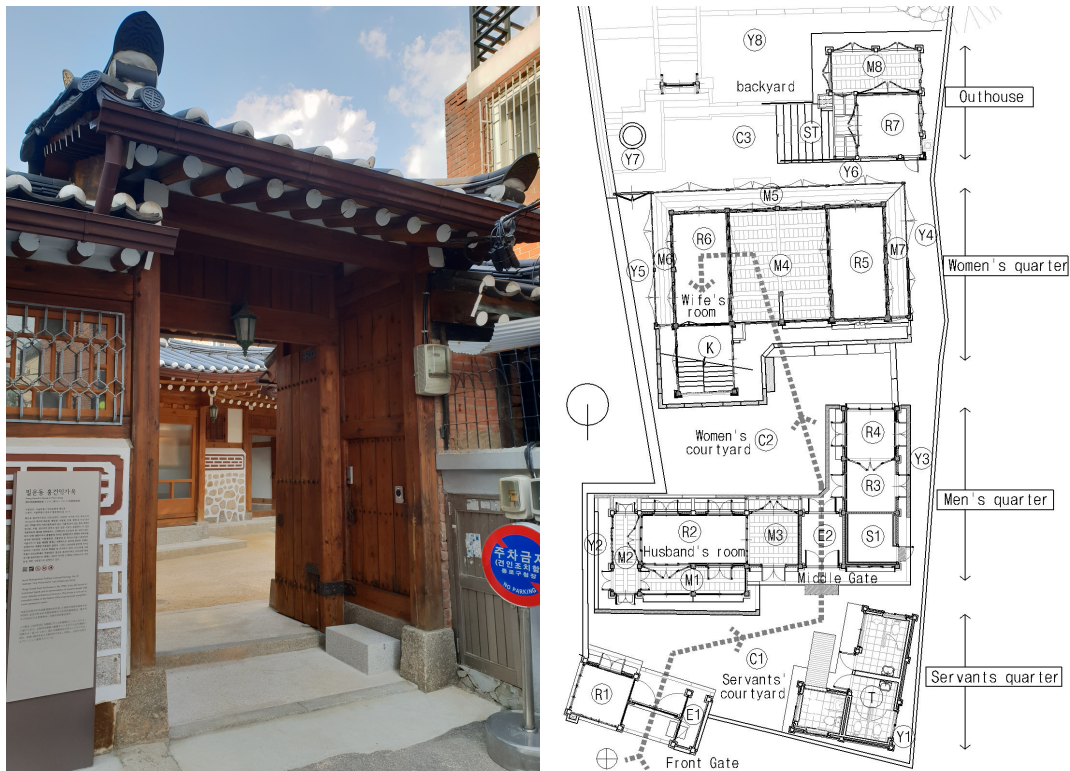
Photo of the main gate from the street and the site plan with floor plans of the five building blocks.
